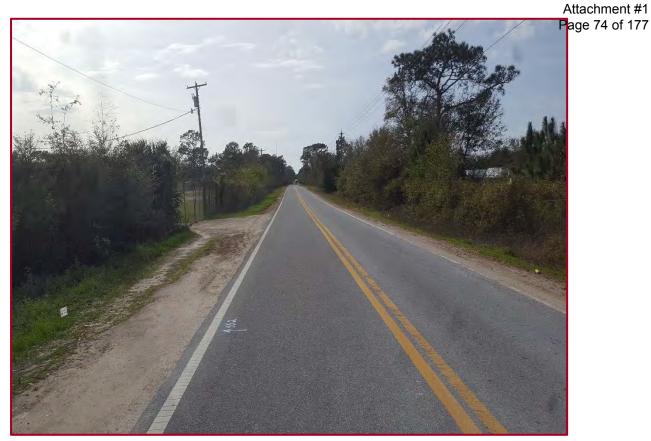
A: EXISTING SITE CONDITIONS ALONG CROSSWAY ROAD NEAR SOIL BORING SS-2 (FACING WEST)
